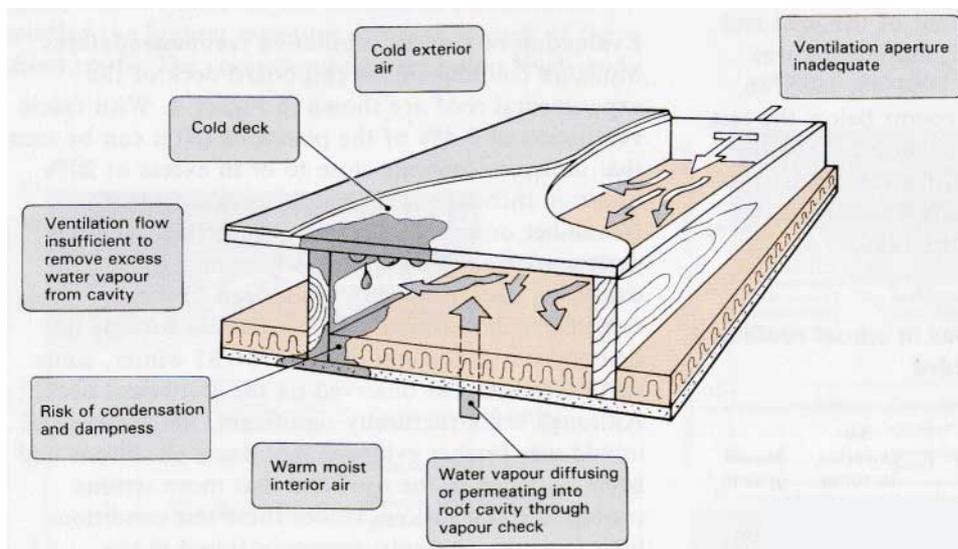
Inadequate ventilation has serious consequences for cold deck flat roofs
